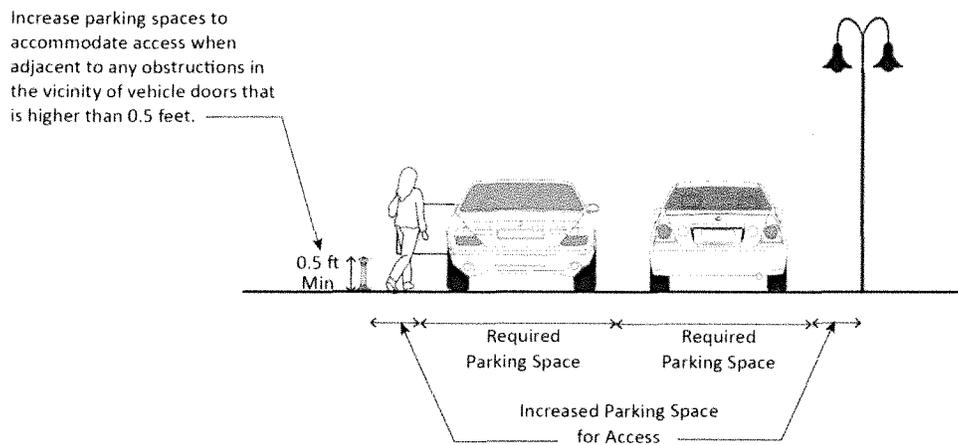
D.3: PARKING SPACES ABUTTING WALL OR FENCE
